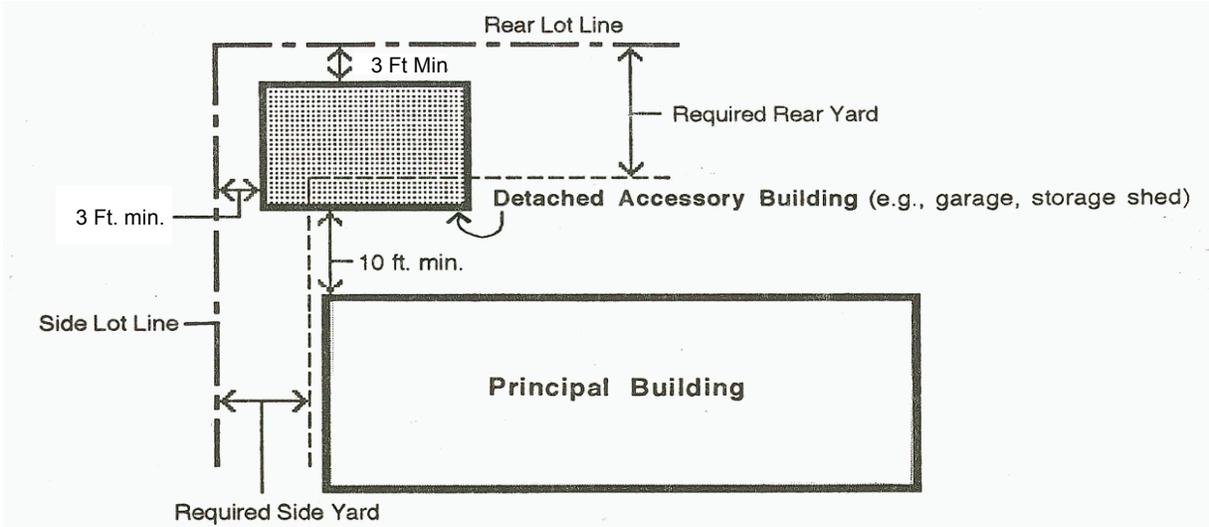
Location(s) of Accessory Buildings on Lot.
